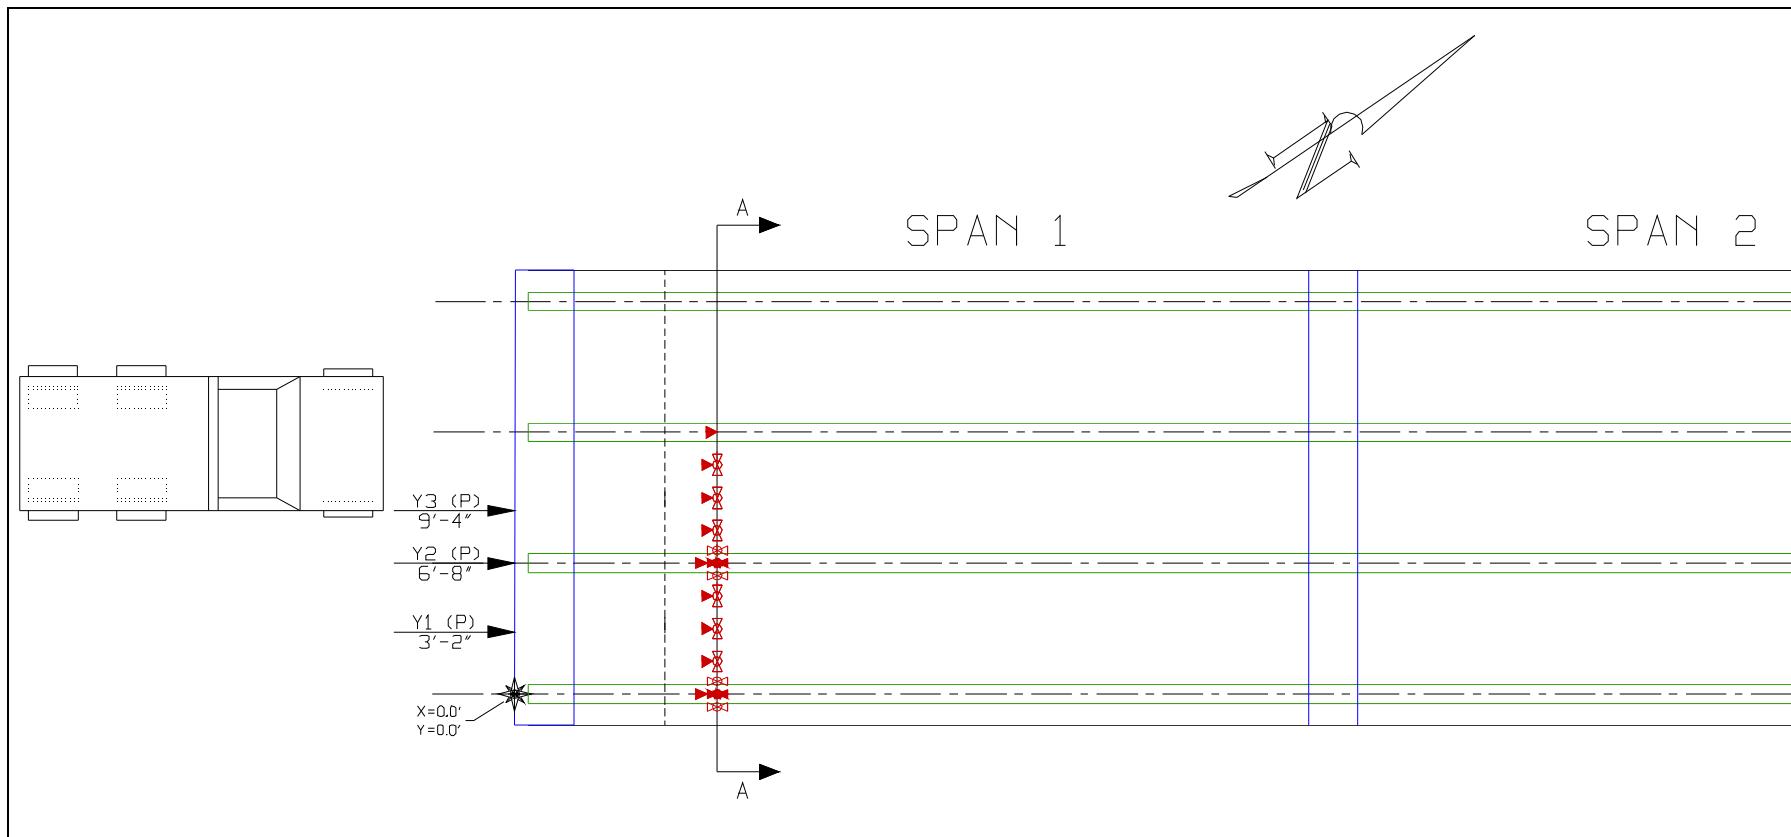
Typical strain gage and LVDT at midspan of FRP deck panel.
